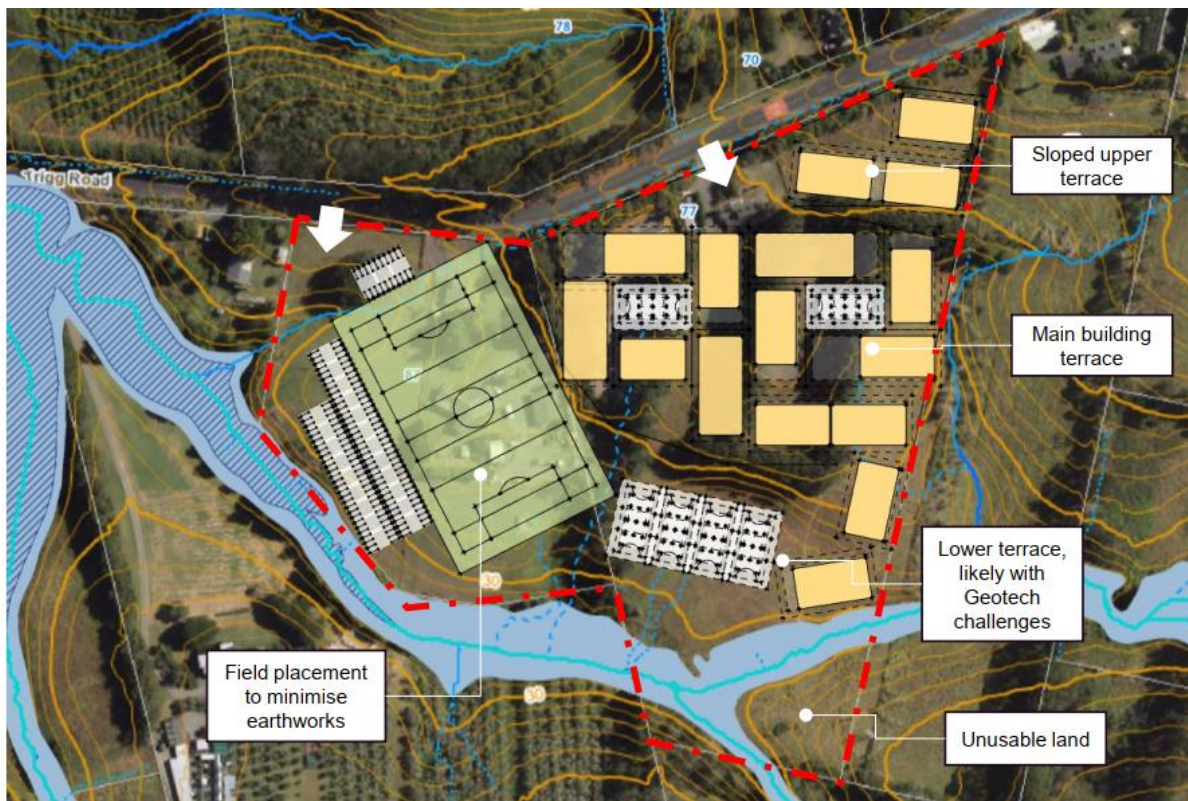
Site 40/49 layout (Source: The Ministry's School Property Standard Planning Team)
